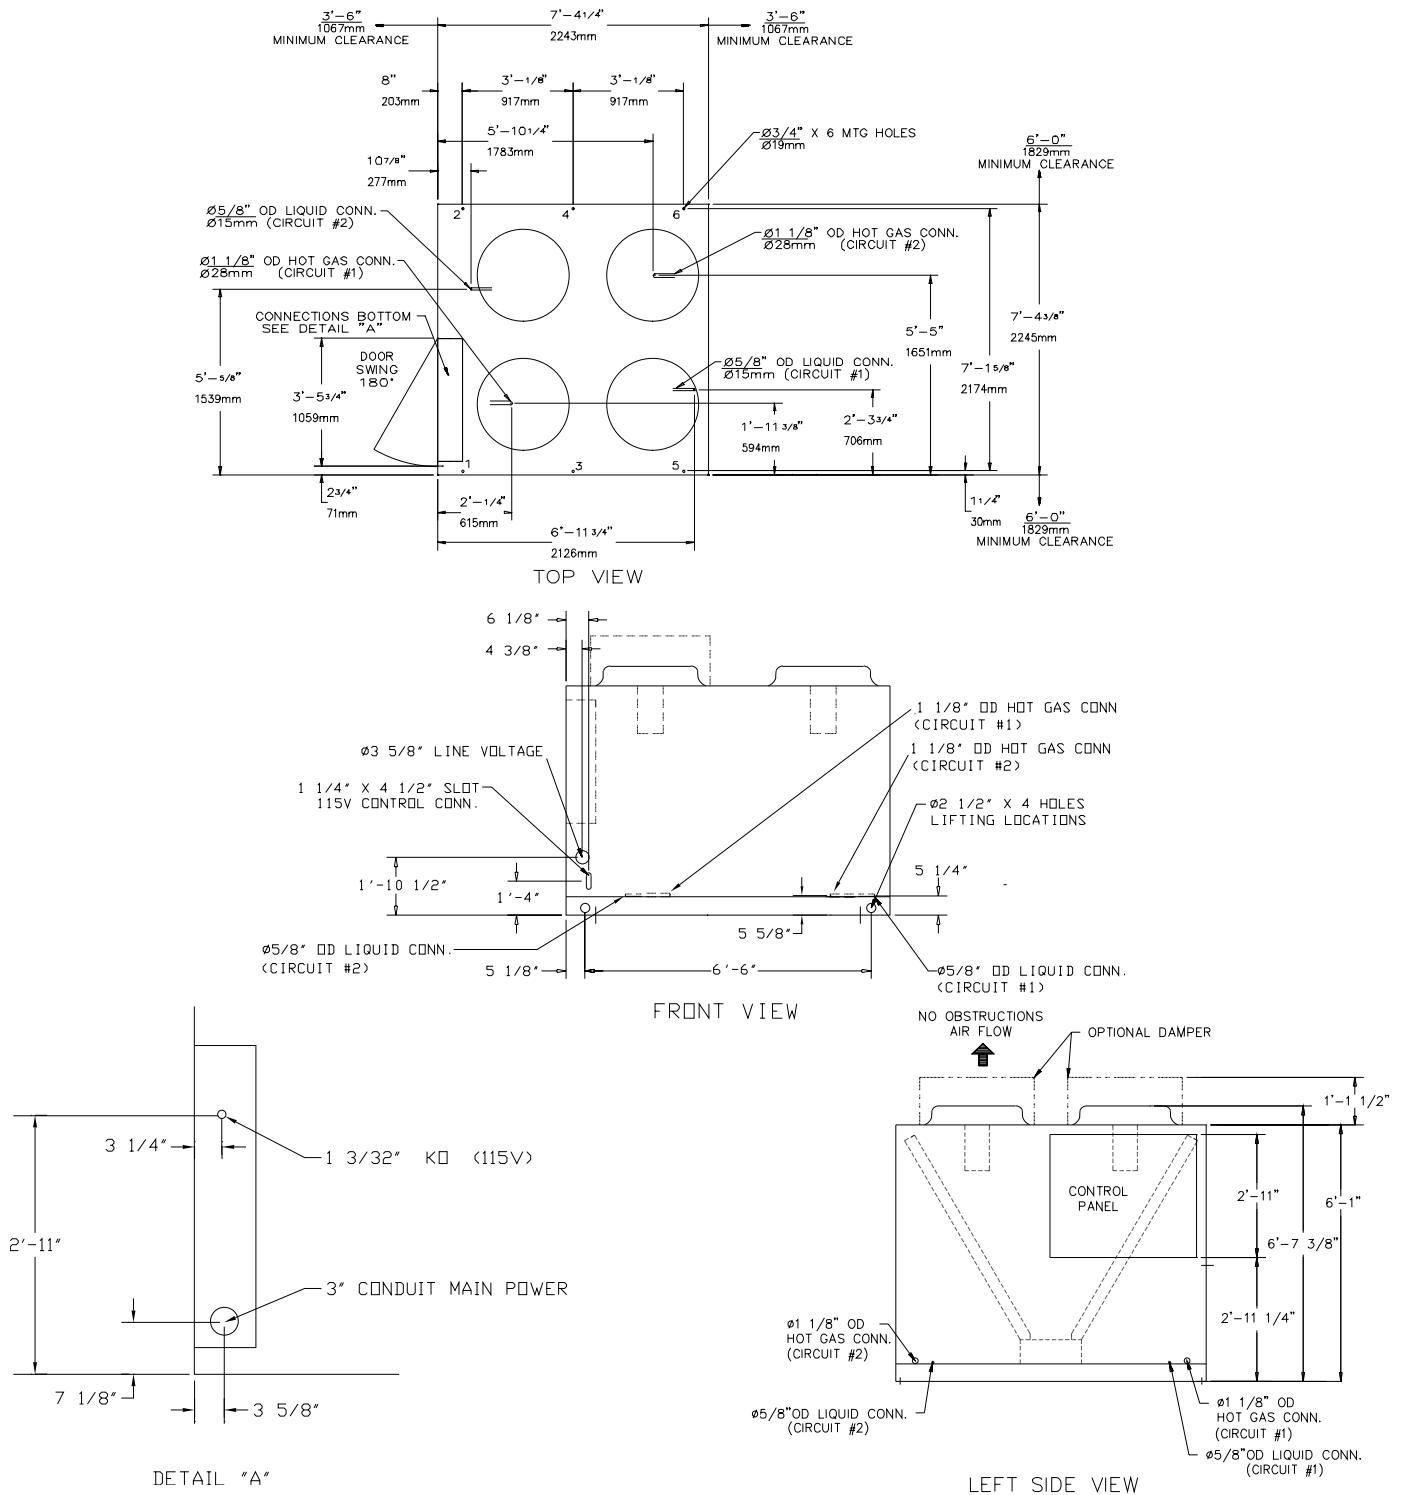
CAUC-C30 Unit Dimensions, Recommended Clearances, Mounting Locations, Electric and Refrigerant Connection Sizes and Locations
